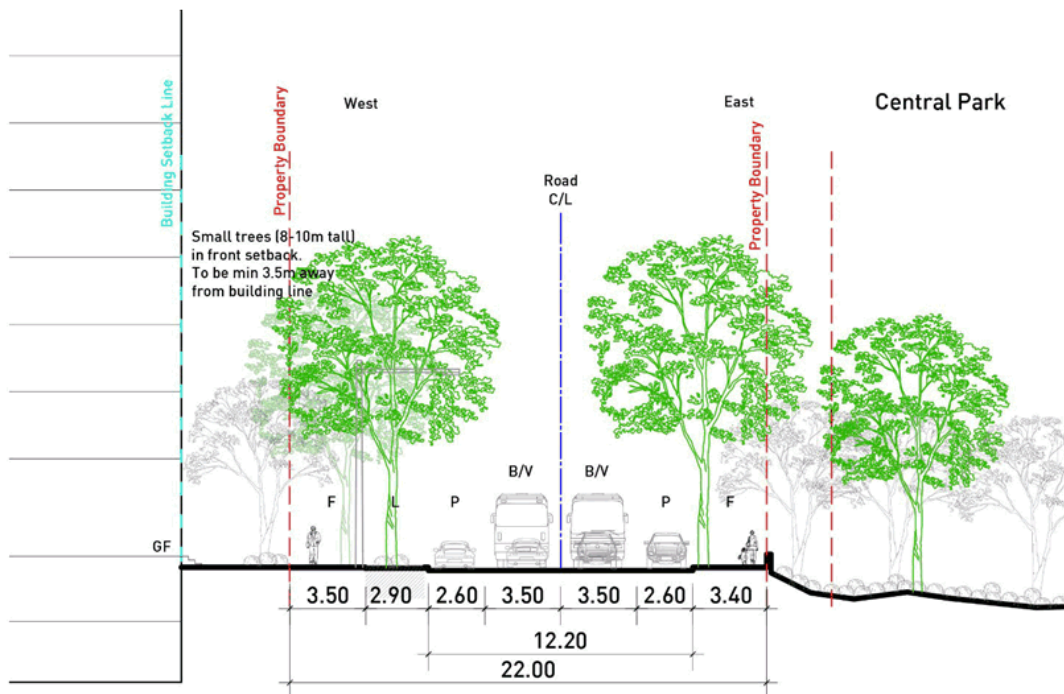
Type 1B Major Road Central Park Interface (NSR 2 between EWR 4 and EWR 6)
